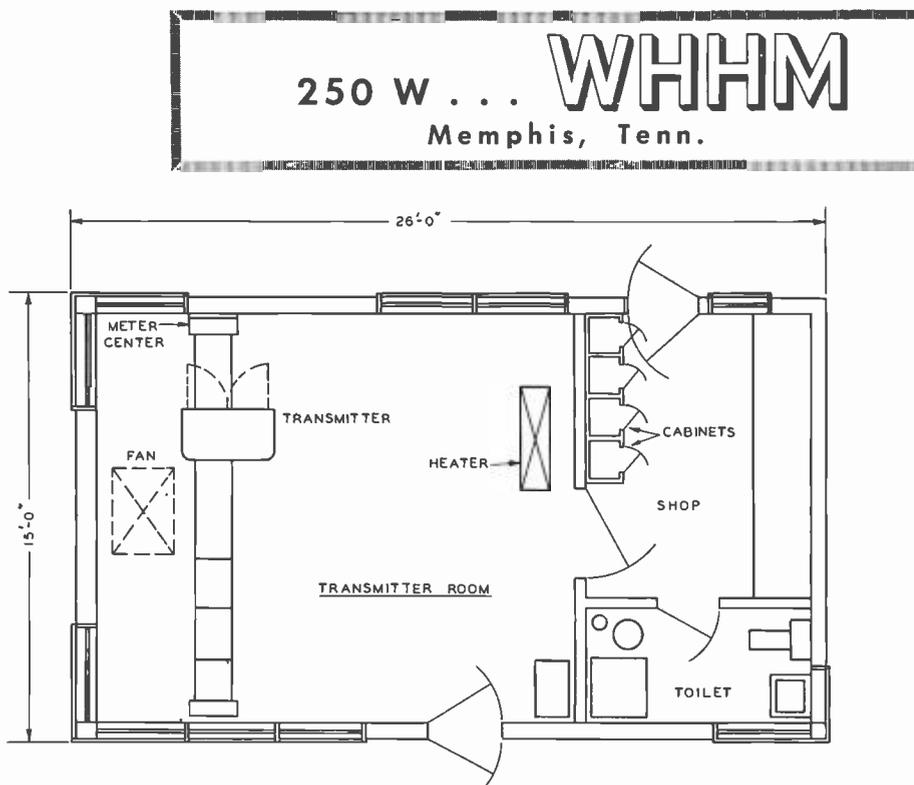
This floor plan shows the equipment layout of the WHHM transmitter building. Note exhaust fan is mounted in the ceiling near the transmitter. WHHM finds this layout adequate except that it lacks sufficient storage space.
